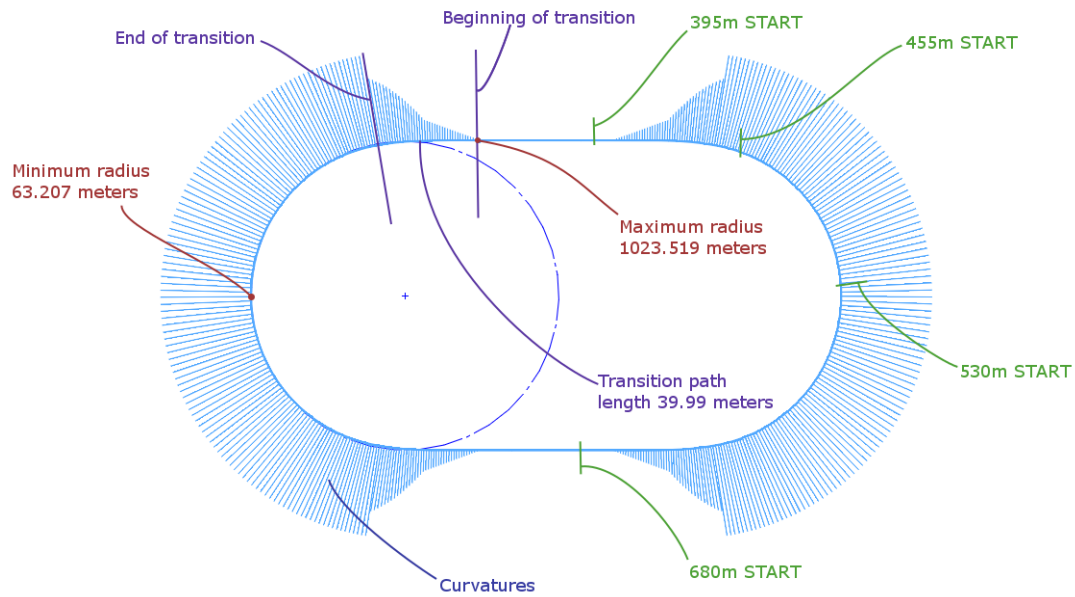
Plan view of the proposed Murray Bridge track showing track curvatures and transitions.
